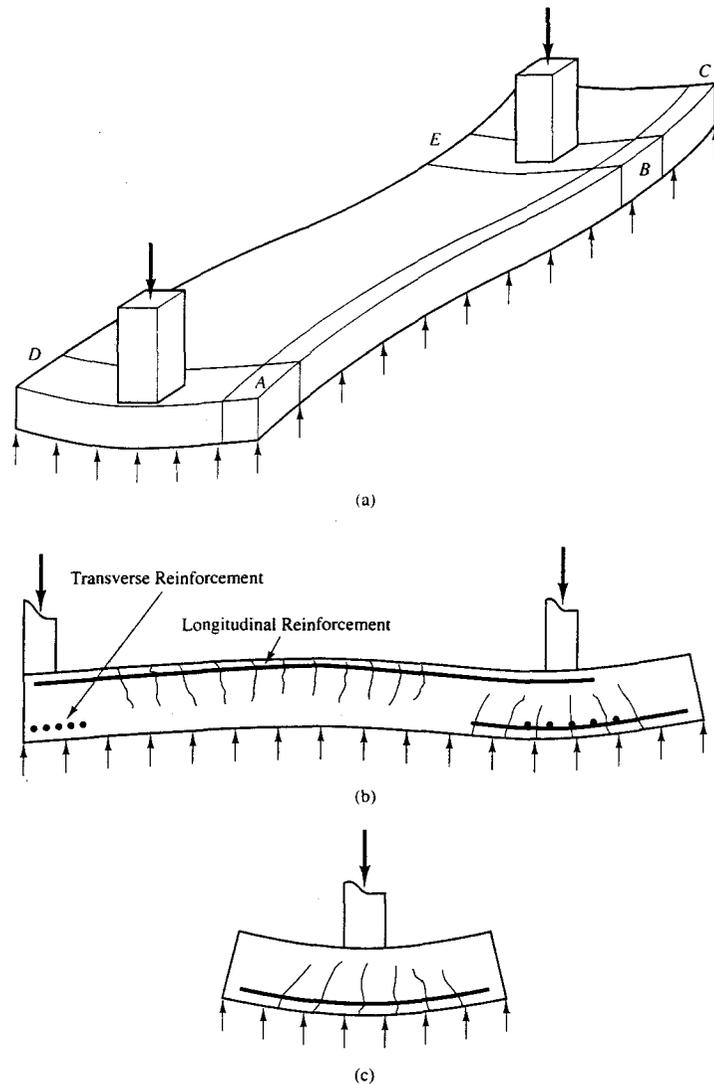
Structural design of combined footings: (a) idealized beam strips; (b) longitudinal beam strip; (c) transverse beam strip (Adapted from MacGregor, 1996).
